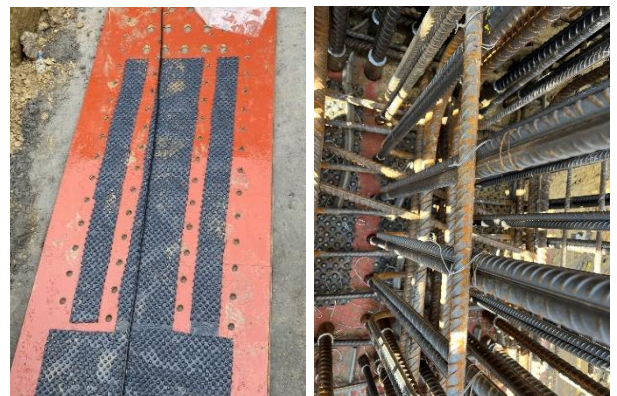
Prefabricated formwork plate used for the first phase of concrete (before and after placing the rebars)
